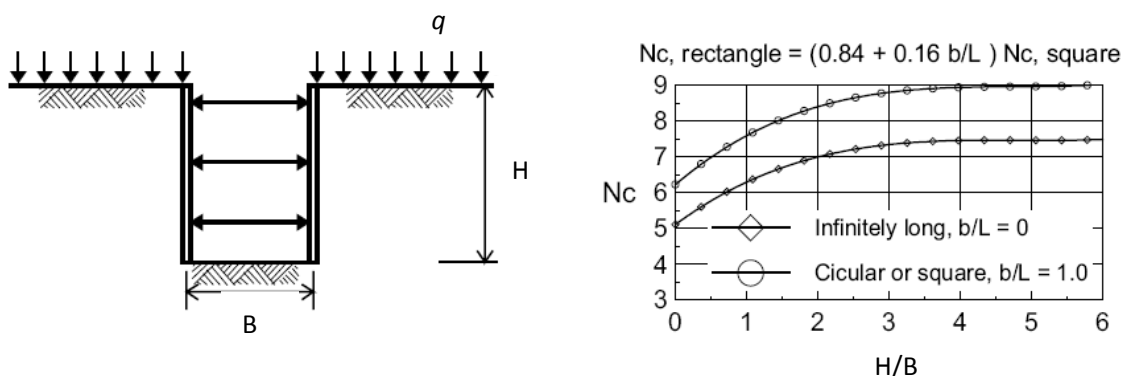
Bottom Heave for Deep Excavation ($B/H \leq 1$)
